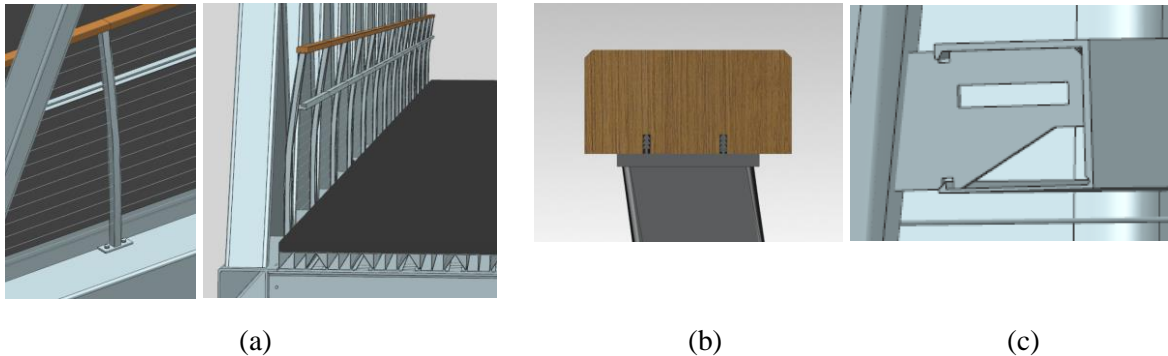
Handrailing: (a) Railing connection to lower chord and perspective view (c) Top handrail connection (d) Lower handrail connection.
